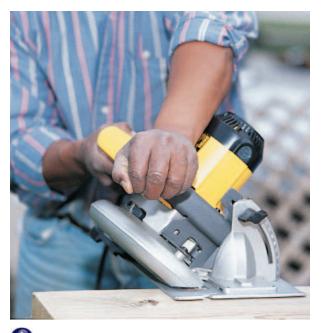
Cutting a Bevel Beveled End When making a bevel cut
